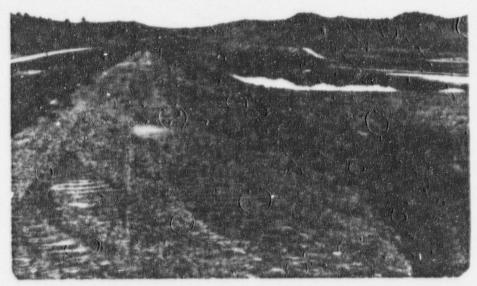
VIEW OF CREST AND UPSTREAM SLOPE OF SADDLE DAM, LOOKING FROM NORTH TO SOUTH.
